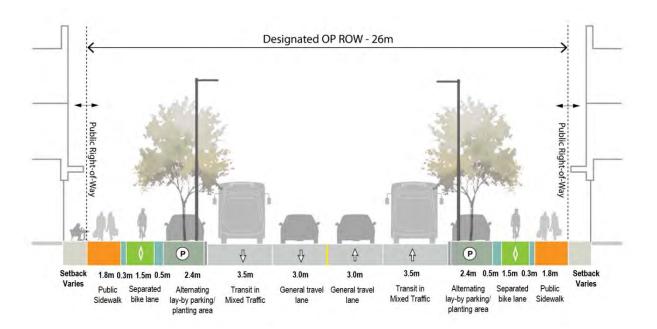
Preferred ROW Alternative (Segment 5A: Mississauga Road to Stavebank Road, and 5C: Hurontario Street to Seneca Avenue)
